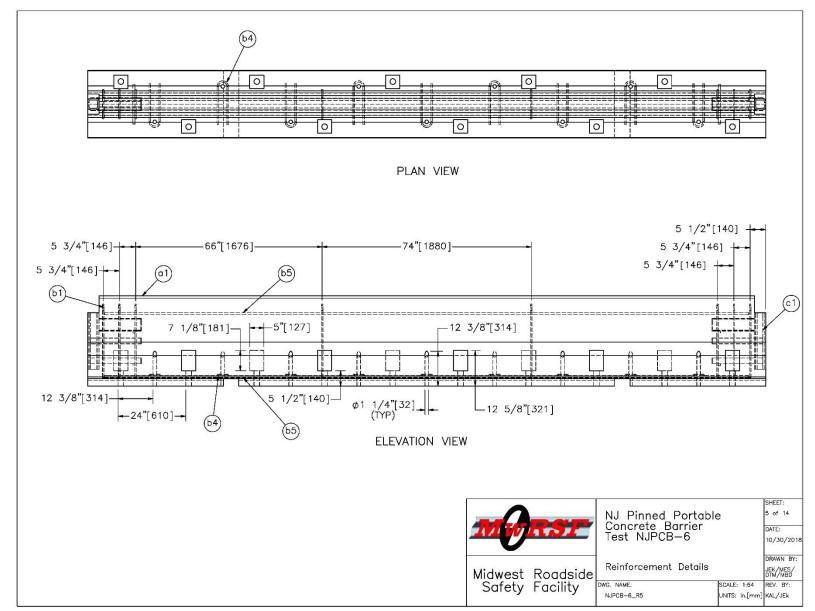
PCB Reinforcement Details, Test No. NJPCB-6
